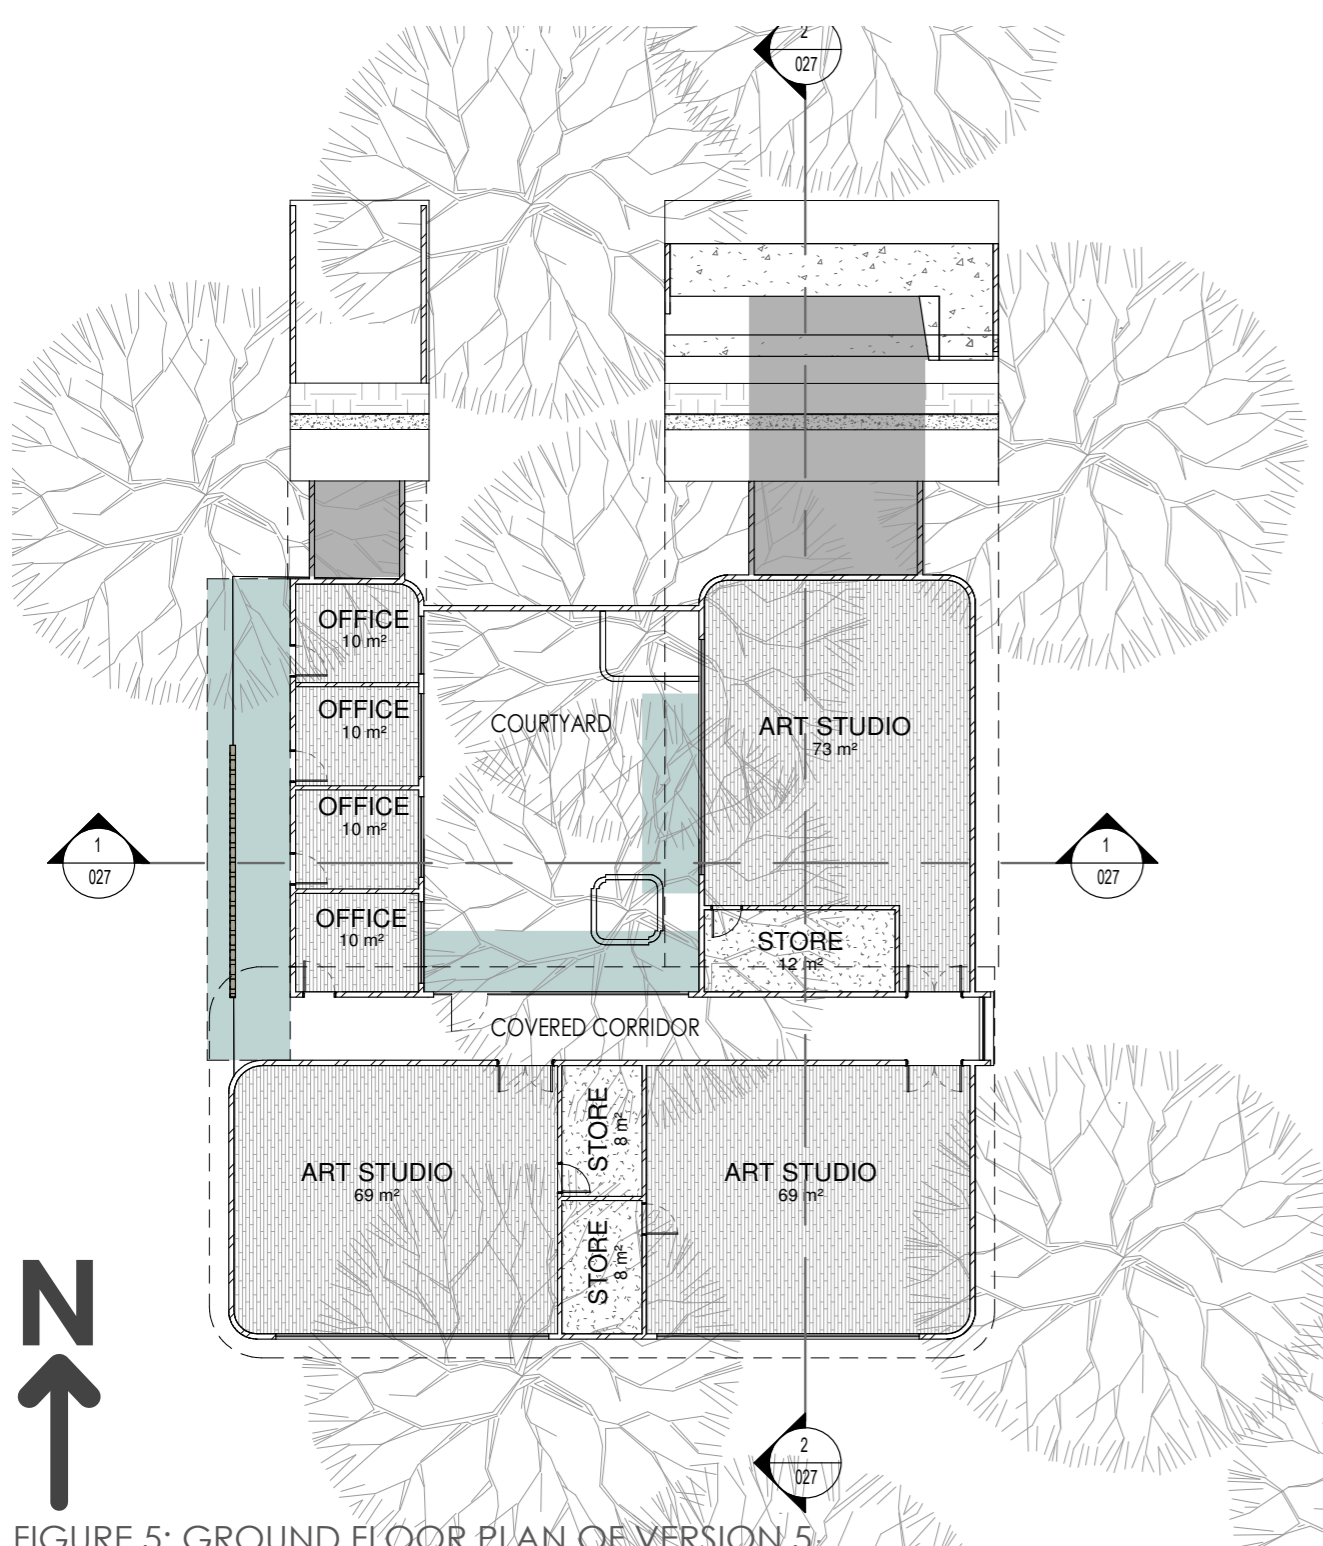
GROUND FLOOR PLAN OF VERSION 5
